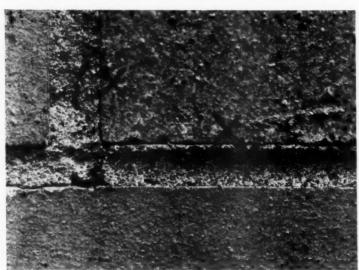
More Cracks (X) Between a Brick and Adjoining Mortar.
